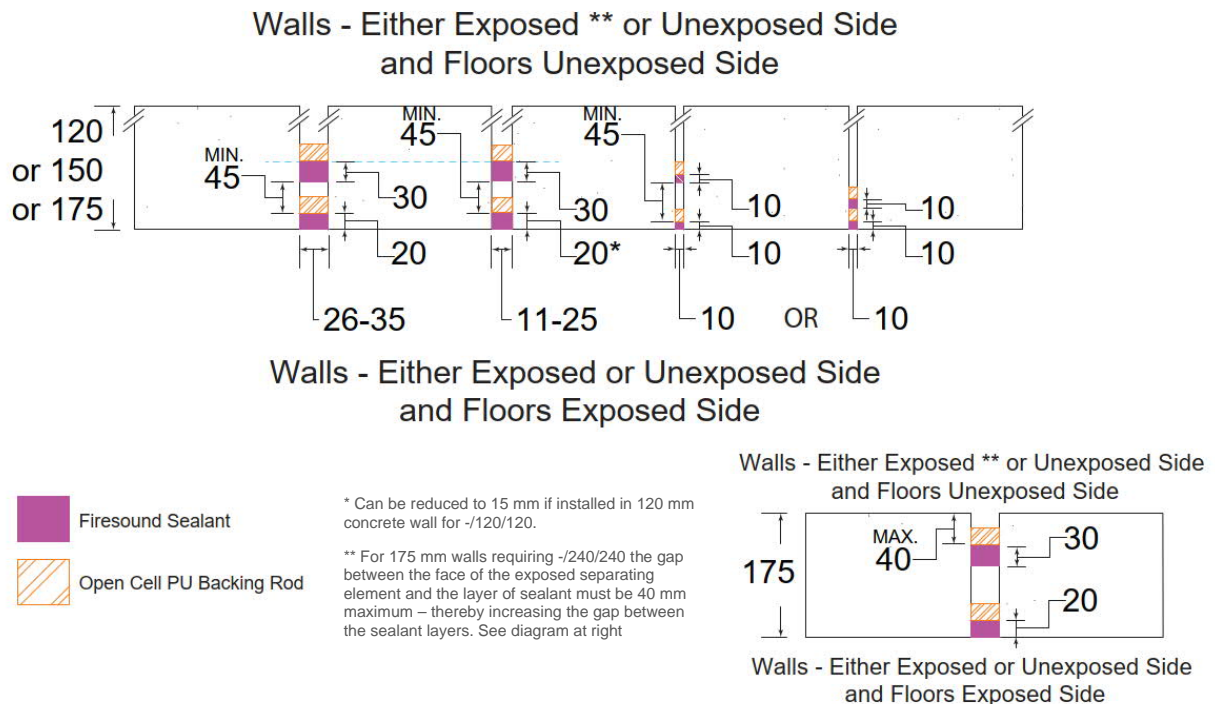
Control joints double caulked with HB Fuller Firesound sealant in concrete walls and floors
